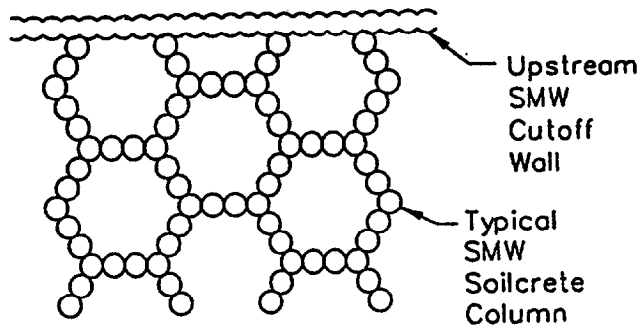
Column layout and cross section of the stabilization of a waterfront birthing and unloading facility in Pascagoula, MS (Hayward Baker, Inc., 1998). (1 ft = 0.305 m)
